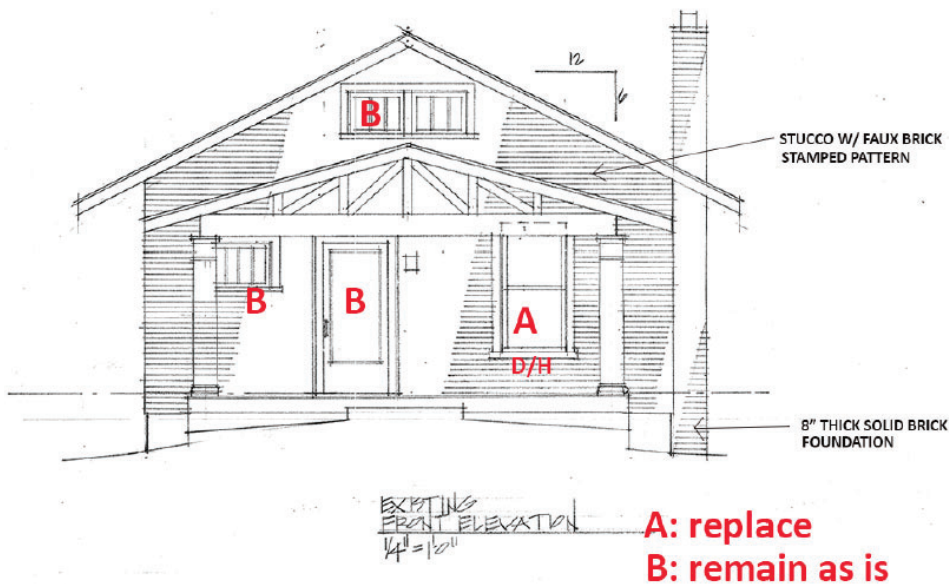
Annotated front elevation drawing showing a single proposed window replacement.
